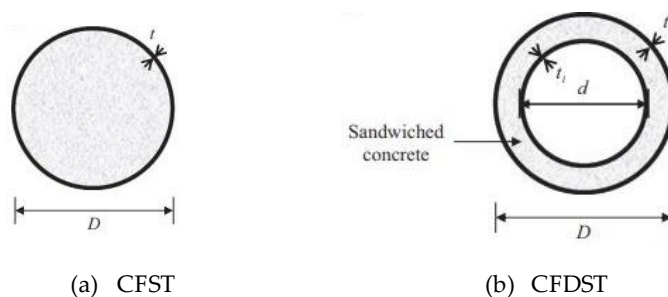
Circular concrete-filled short column types: (a) CFST and (b) CFDST.
